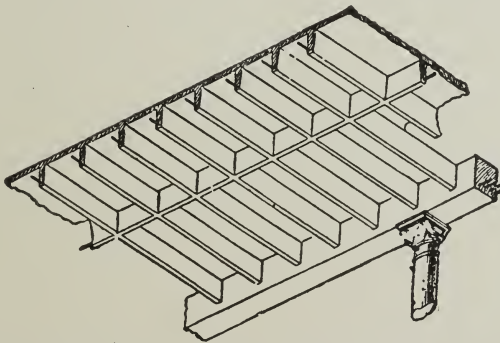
Ransome Reinforced Concrete Floor. Early Panelled Form.
